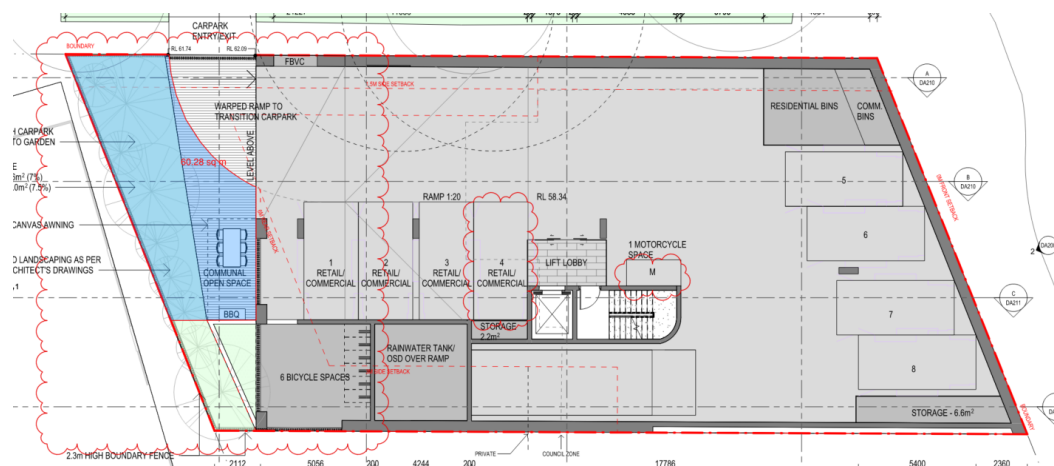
Proposed basement 1 floor plan with the communal open space shaded in blue - 18-20A Perouse Road, Randwick (Source: Curzon & Partners)
